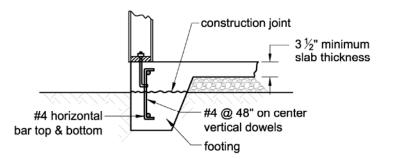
Above-code use of vertical dowels to connect a slab-on-grade to a separately poured footing.
